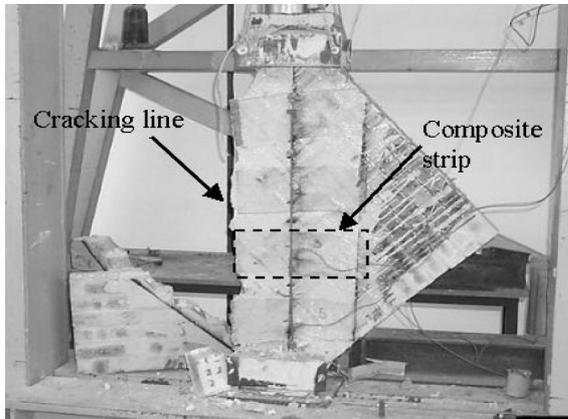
Failure pattern for the masonry wall strengthened with RFV composite
